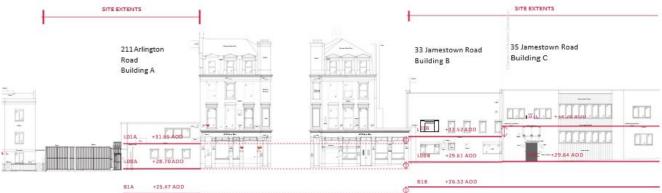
Arlington Road and Jamestown Road site elevation showing misaligned floor levels, which creates an accessibility challenge
